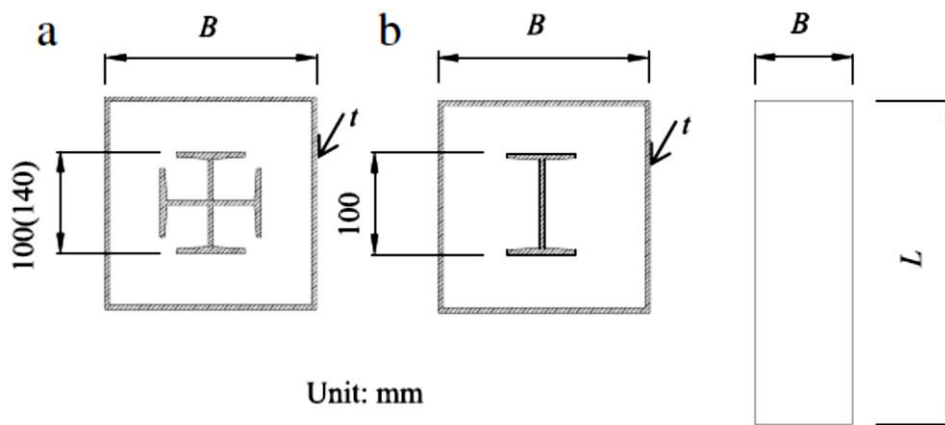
(a) Cross-section of test specimen with cruciform steel section; (b) Cross-section of specimen with I-shaped steel section (Zhu et al., 2010)
